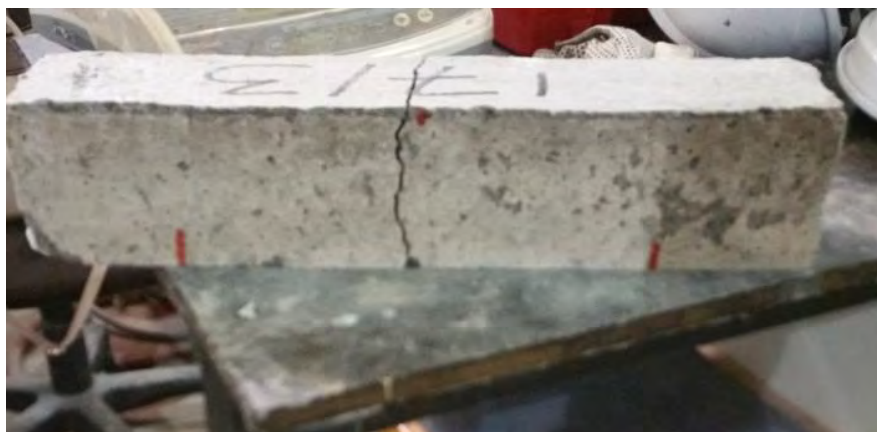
Failure of normal concrete beam after flexural strength test.
